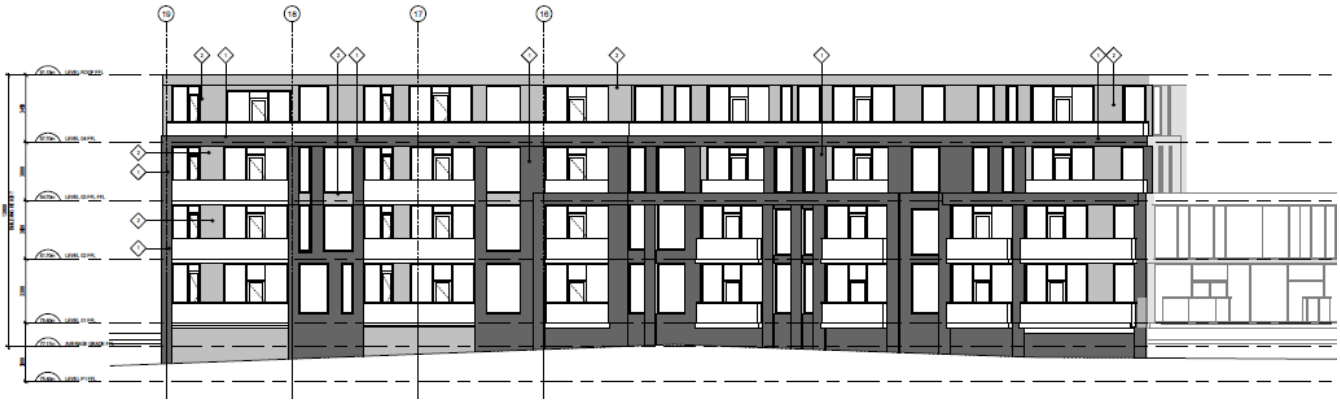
Excerpt from the North Elevation – East Wing drawing of the proposed development
